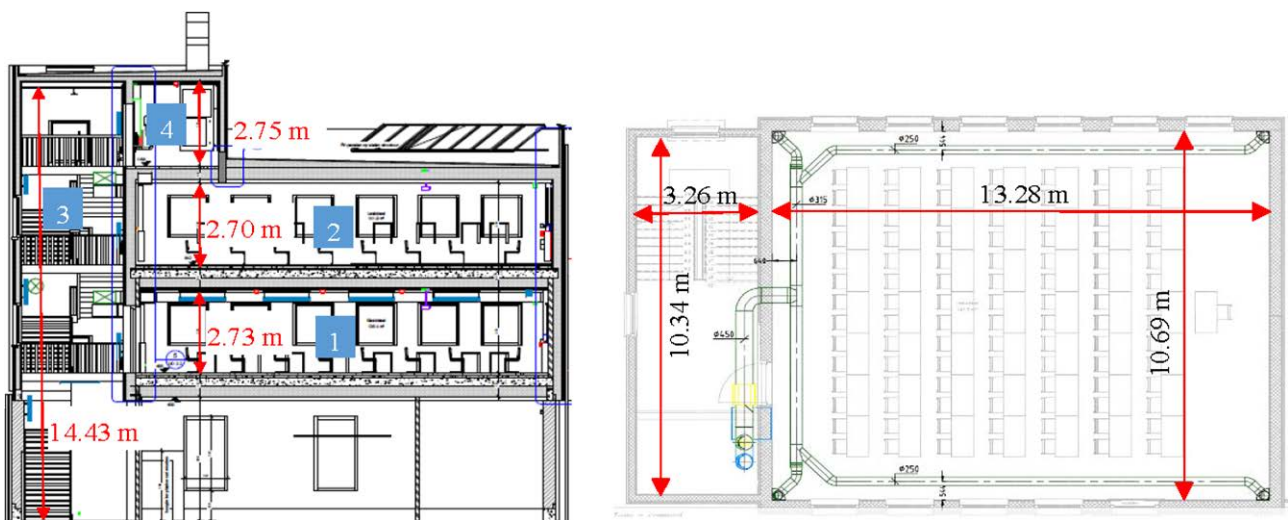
Section (left) and floor plan (right) of the test lecture rooms on KU Leuven Technology campus Ghent.
